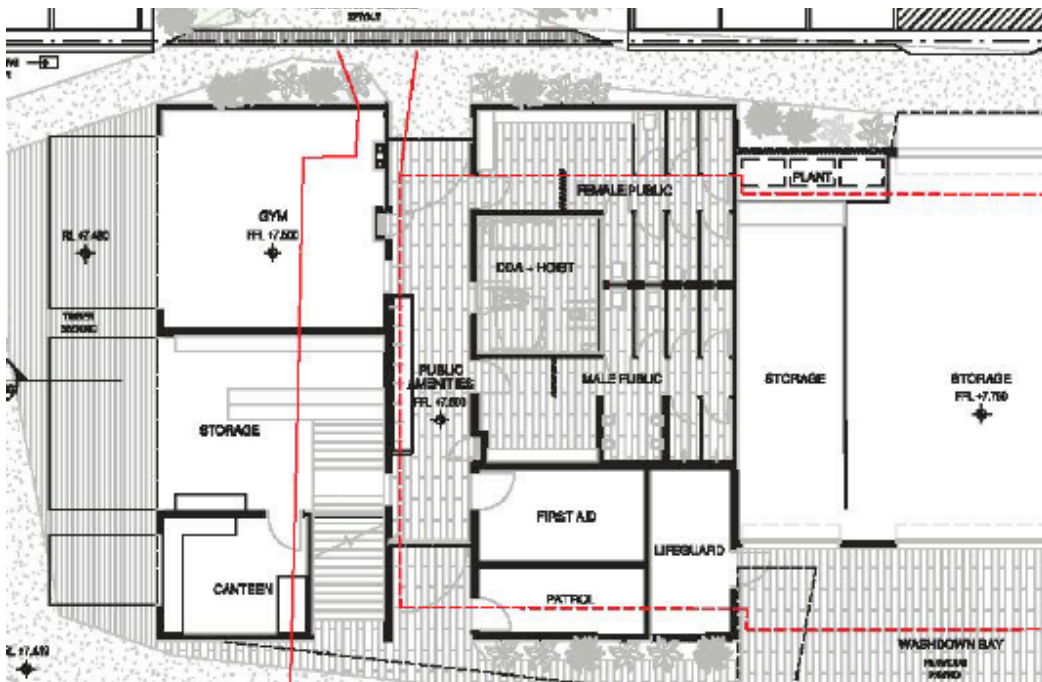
Ground Level Plan (Stamped Plans DA/2018/1771) – As Approved
